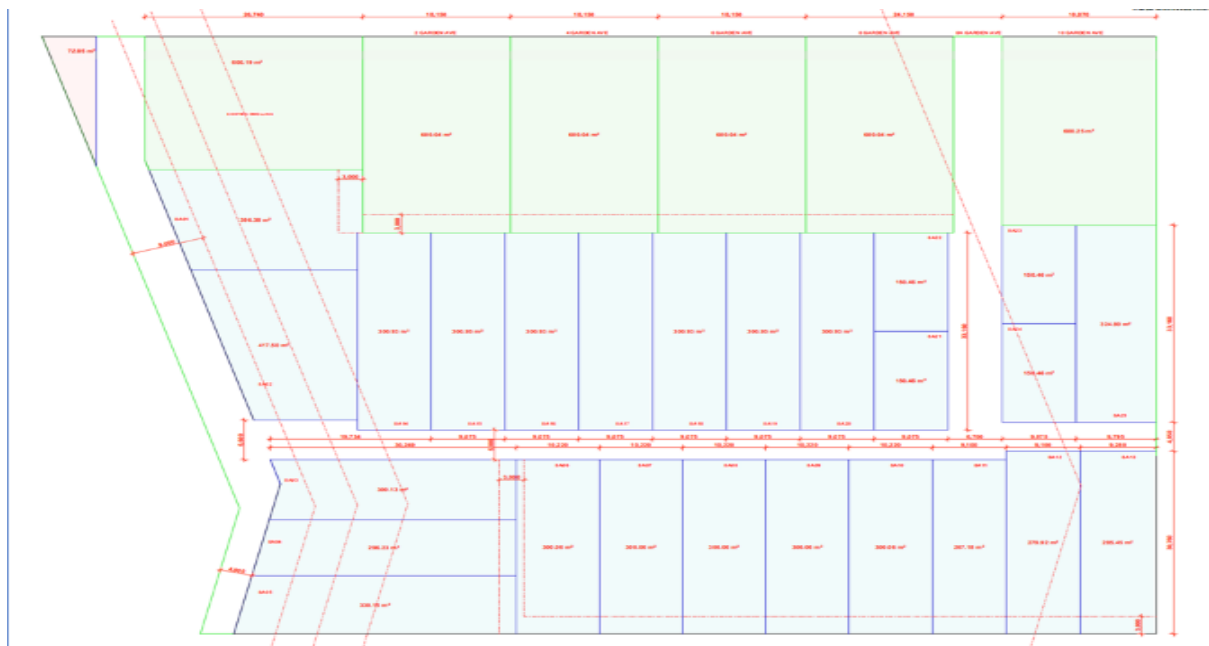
Site and lot layout plan - Story Design Collective (Drawing 202)
